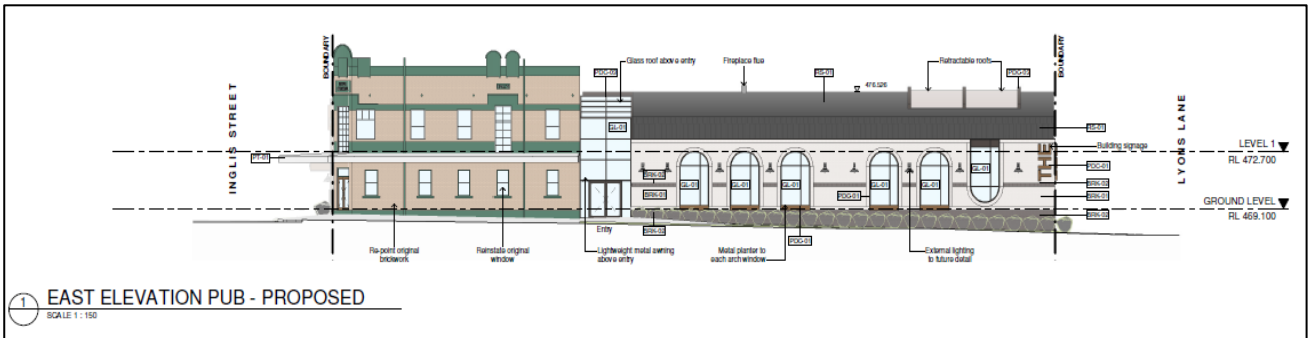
Elevation Plan - Federal Additions (Lewis Street Elevation)
